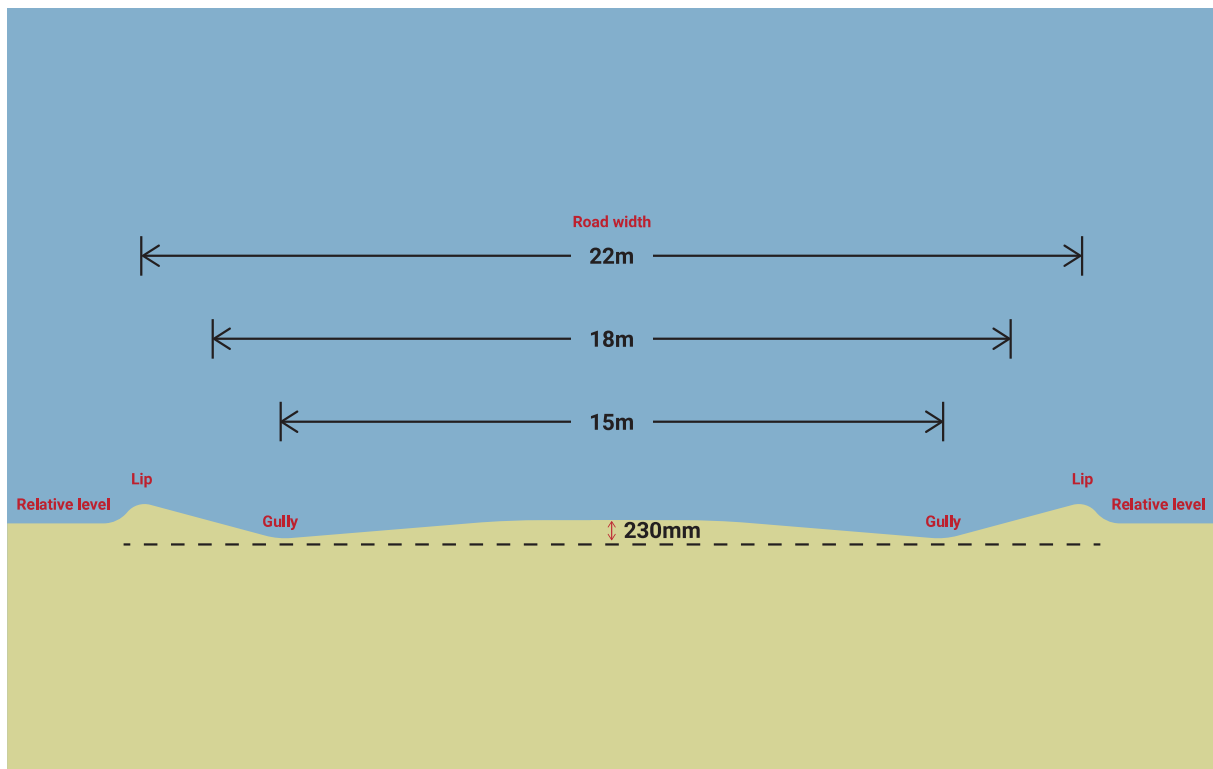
Schematic of the topography of a section of road. Measurements taken from road adjacent to where the crater was backfilled
